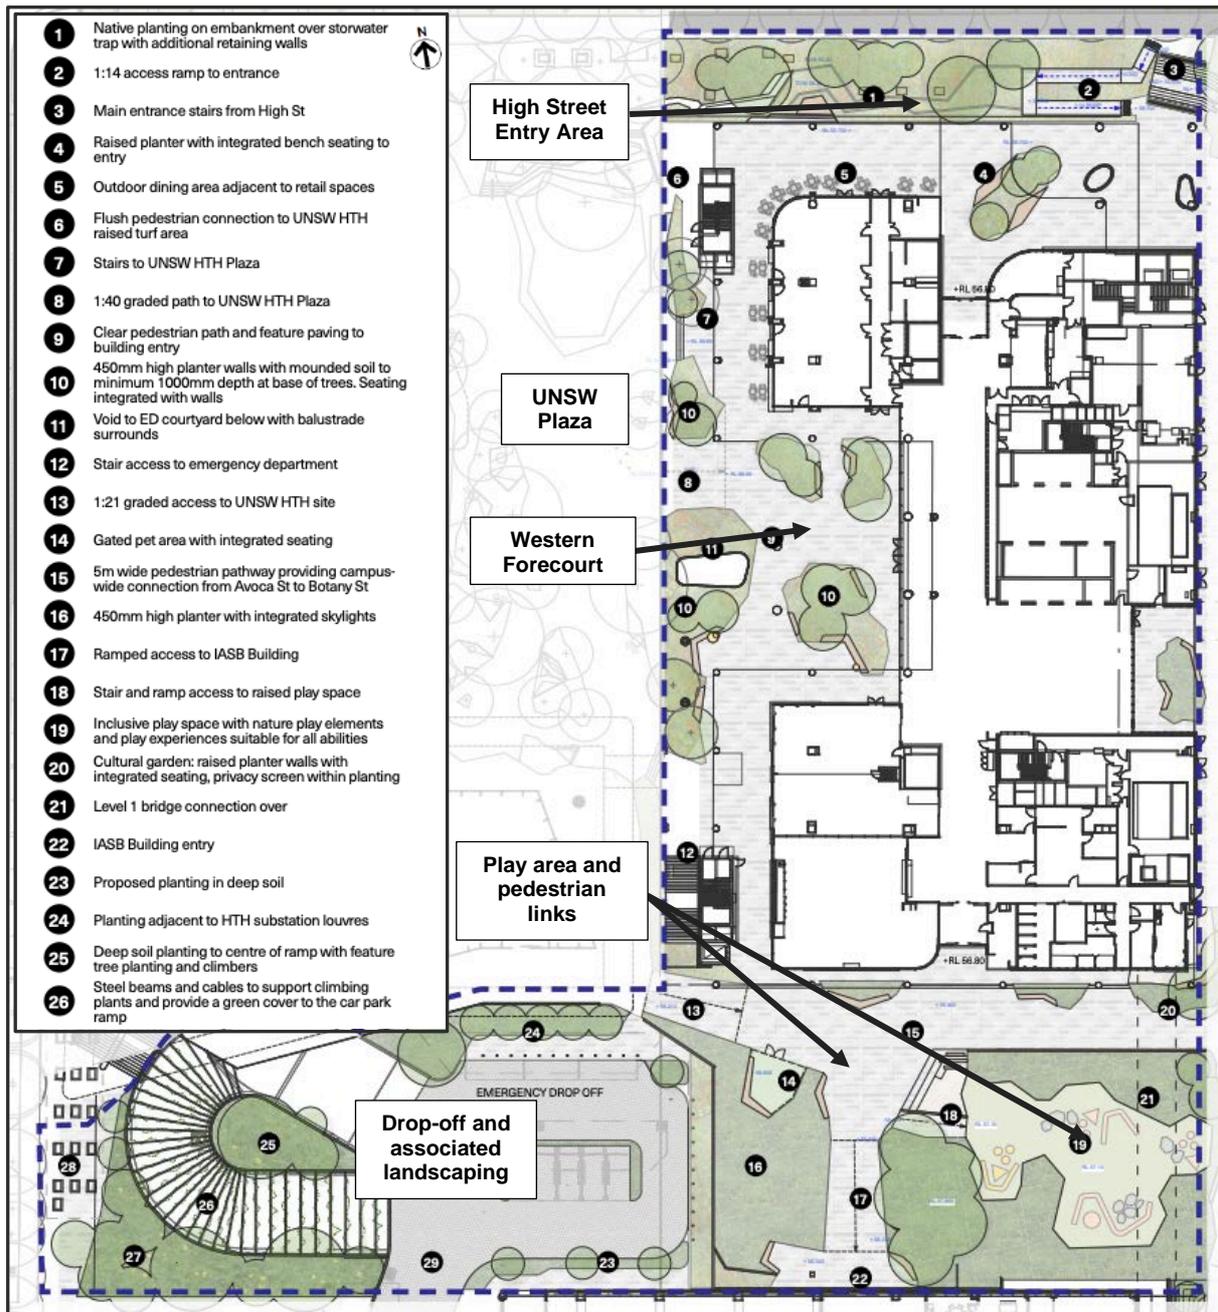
| Extract from landscape plan showing key landscape areas (Base source: RtS)
